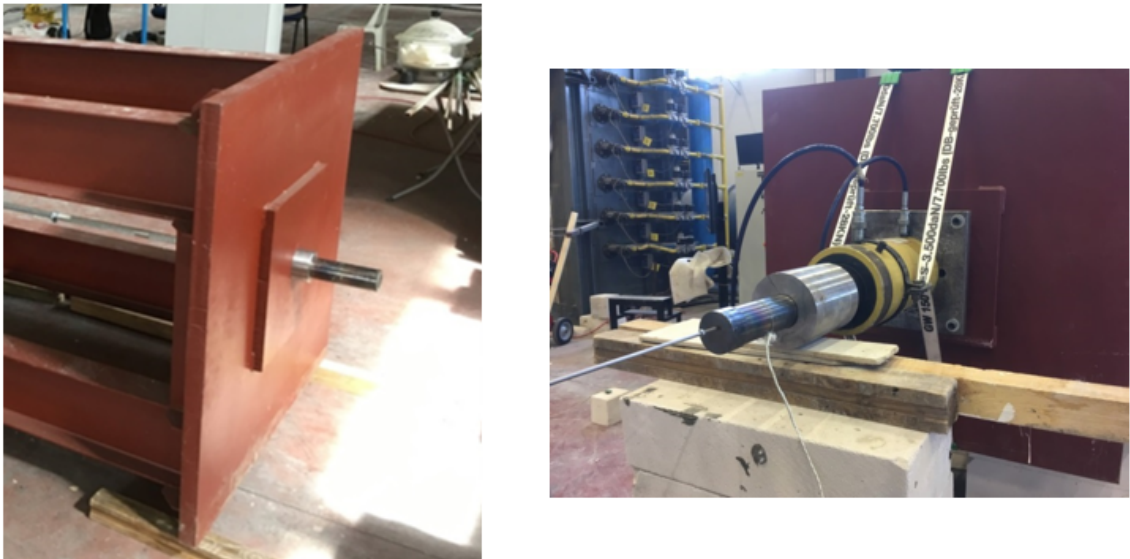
Dead (Passive) end (left-hand side) and active end of the socket head (right-hand side).
